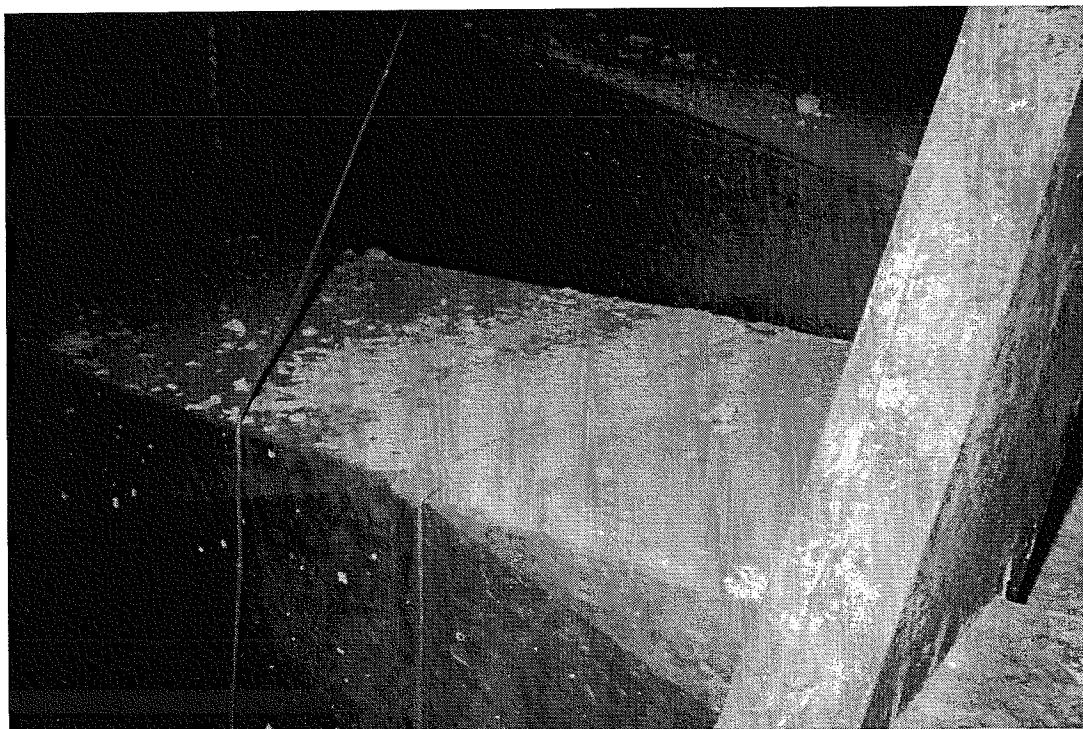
View of delaminated fireproofing debris on top of HVAC duct in 5th floor attic
